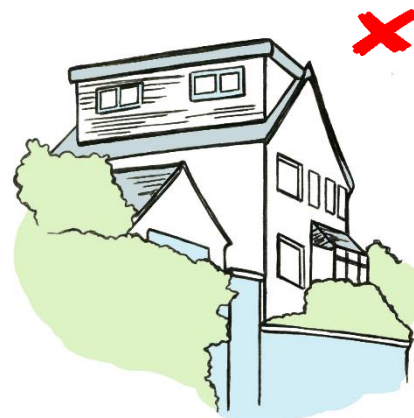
O: Flat Roof Dormers of Almost Full Roof Width will not be Supported
